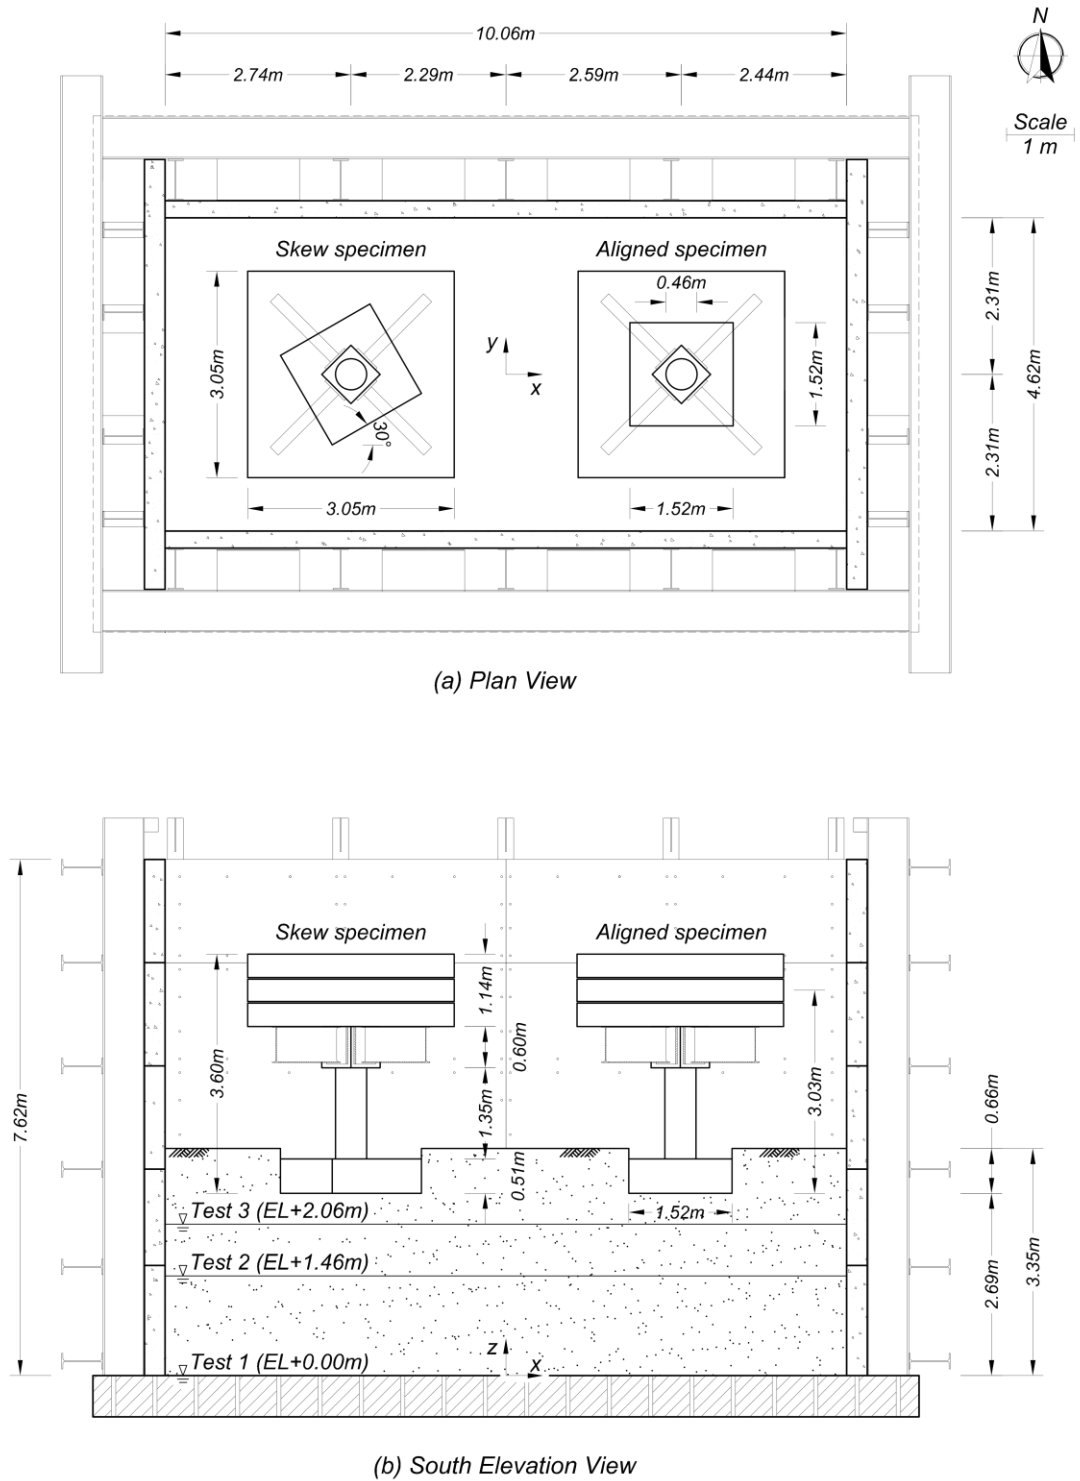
(a) Plan and (b) elevation view of the test setup and basic geometric characteristics of the soil confining box, the soil and the bridge column specimens. The direction of shaking is along the West-East direction.
